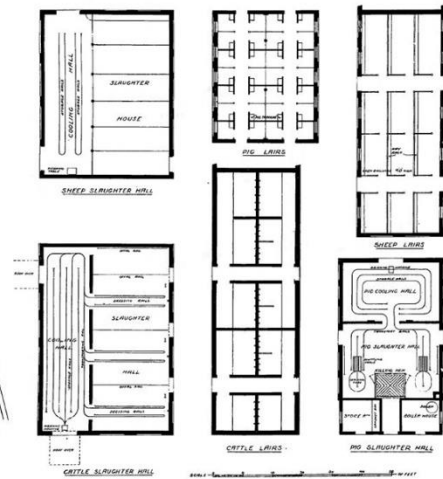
BARROW-IN-FURNESS. PLANS OF LAIRS, COOLING HALLS, SLAUGHTER HALLS, ETC.
